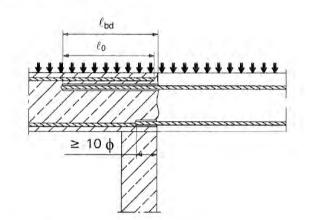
End anchoring of slabs or beams (e.g. designed as simply supported)
